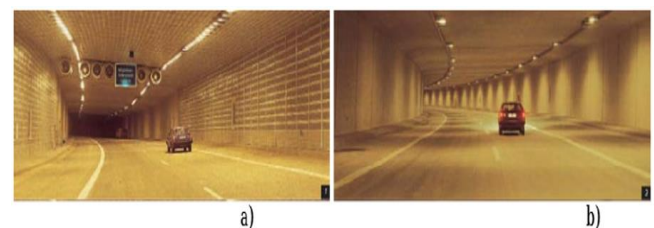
Lighting of underpasses and road tunnels: a) threshold area; b) transition area [6]
